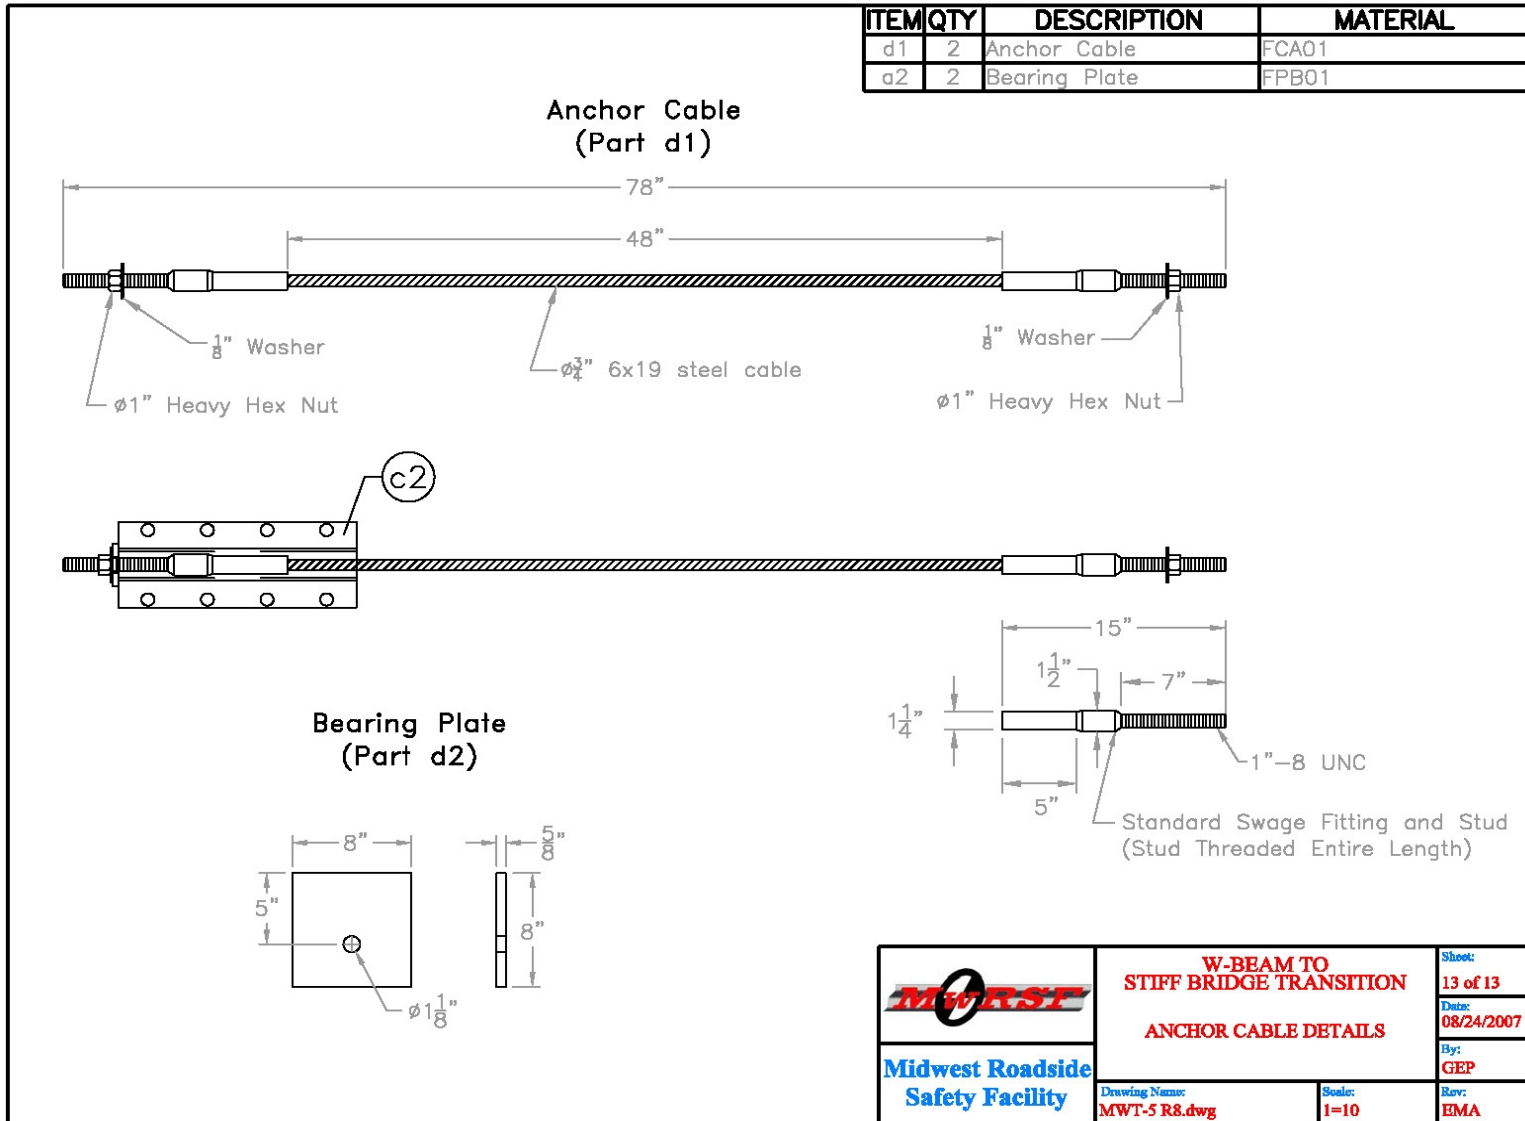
Anchor Cable Details, Design No. 3 (English)
